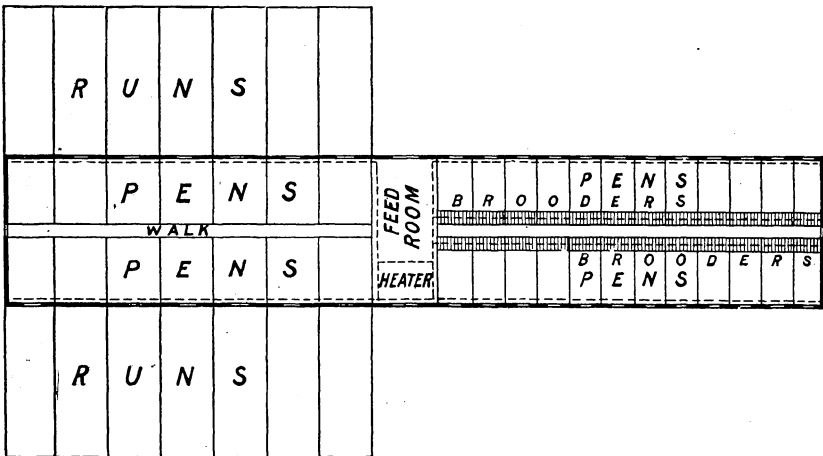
Plan of a double brooder house, showing arrangement of heating pipes.
